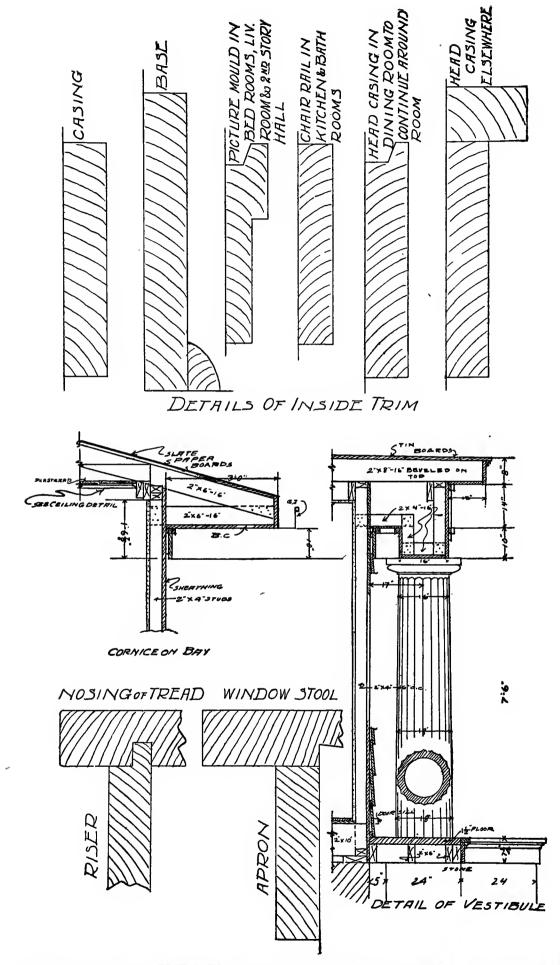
CONSTRUCTION AND FINISH FOR SUMMER RESIDENCE
